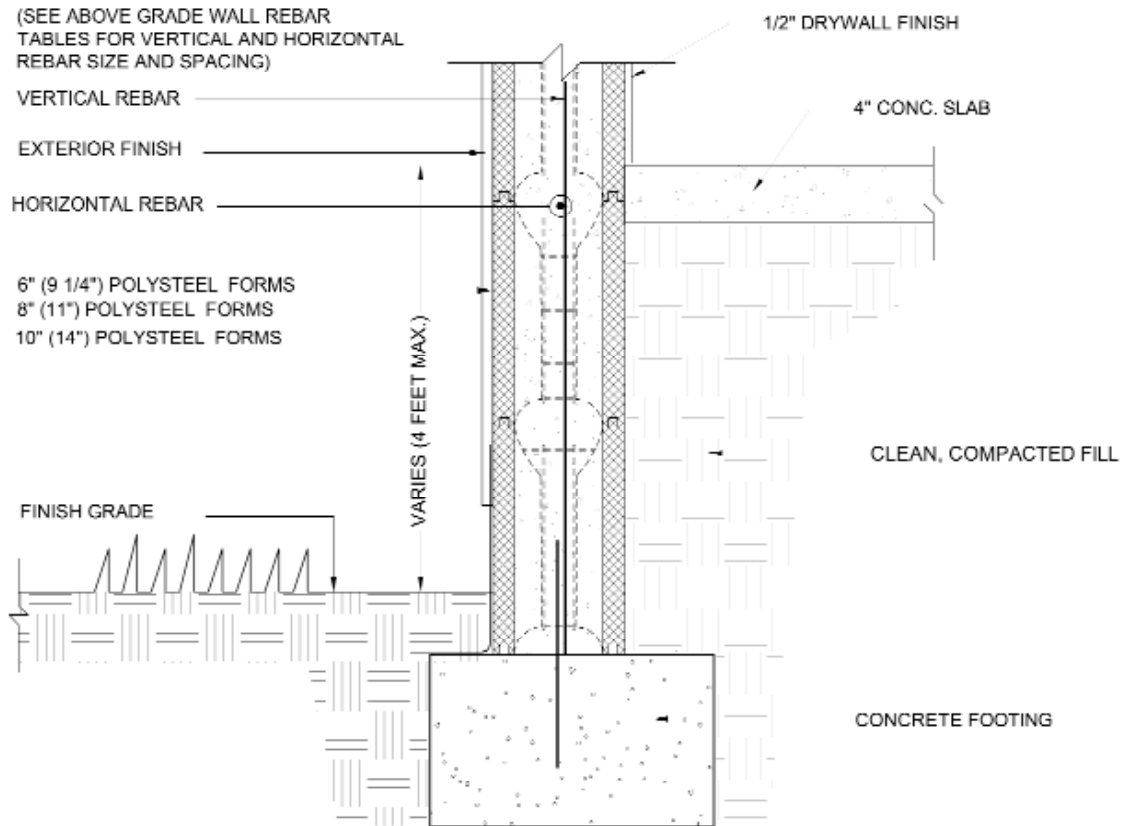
STEM WALL AND FLOATING SLAB FOR FRAME CONSTRUCTION
